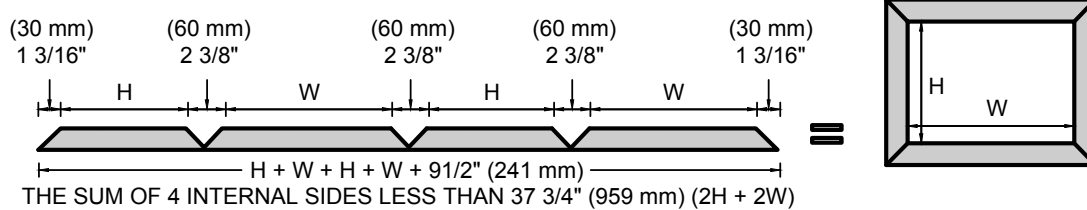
CLOSURES – 4 BOLT FLANGE
